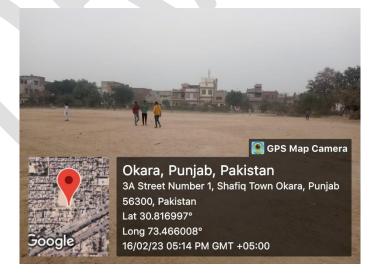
New Proposed site X Block of Ground, Govt Colony Park
